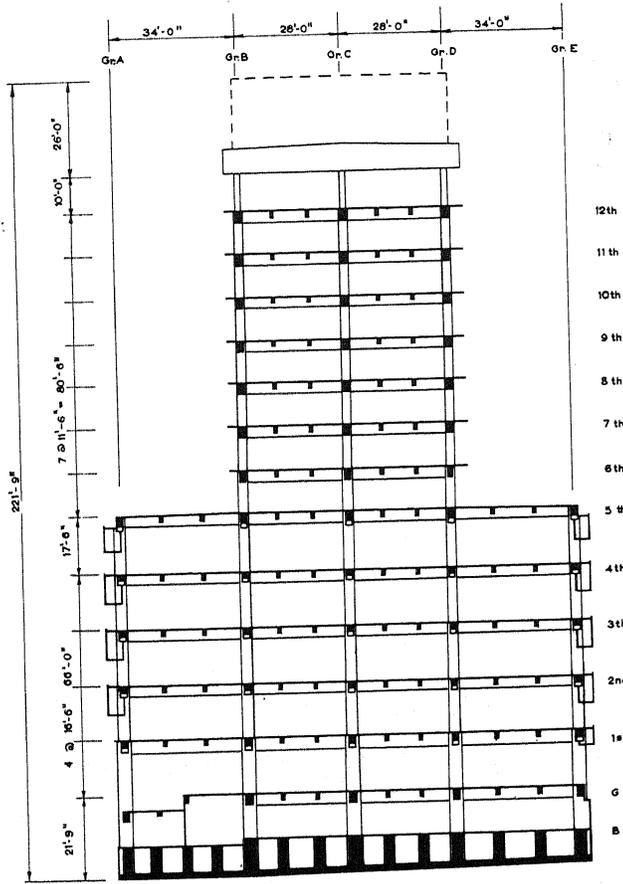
CROSS-SECTION OF POSTAL CENTRE
